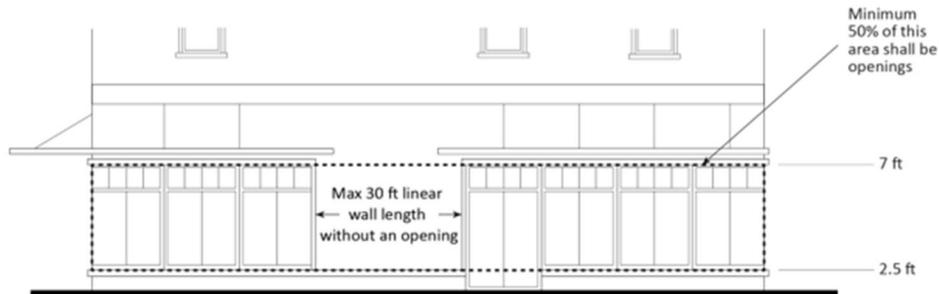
(A): BUILDING TRANSPARENCY/REQUIRED OPENINGS
